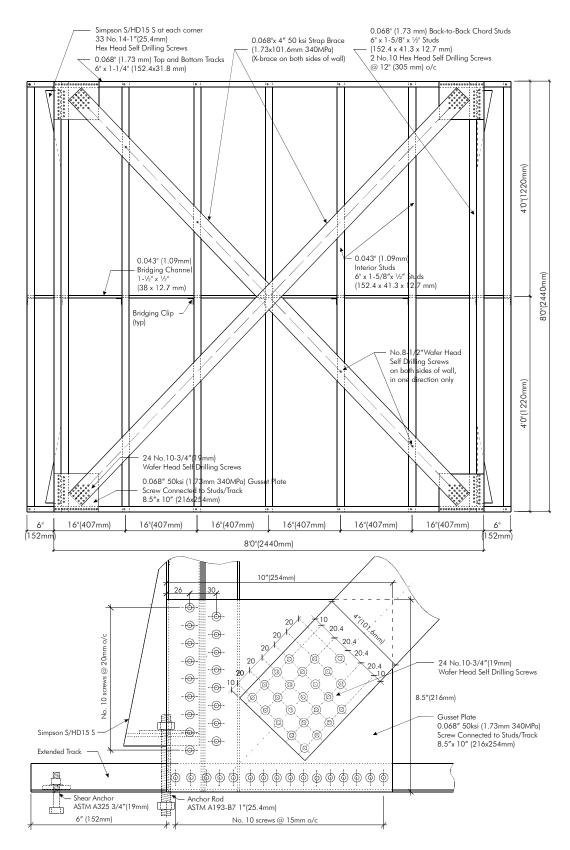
Nominal dimensions corner detail of specimens 37A-M and 38A-C
